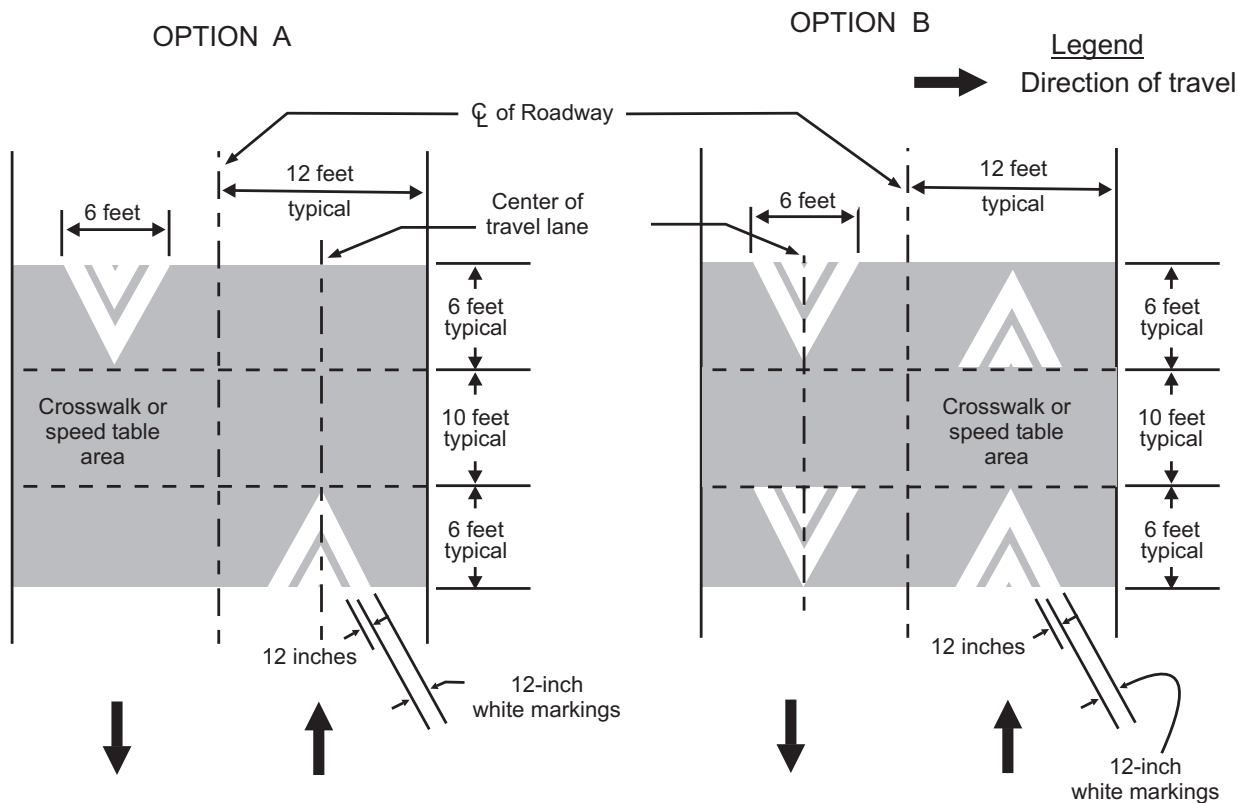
B-30 Pavement Markings for Speed Tables or Speed Humps with Crosswalks
